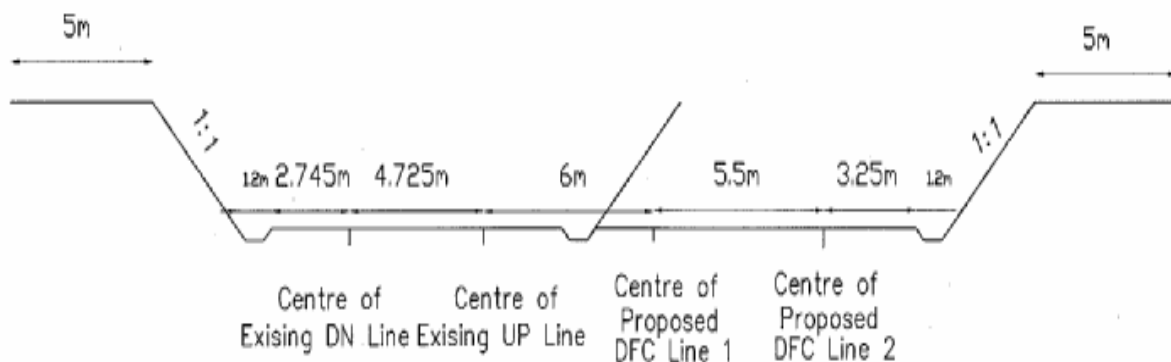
Typical Section in Cutting for Track Parallel to Existing Line
